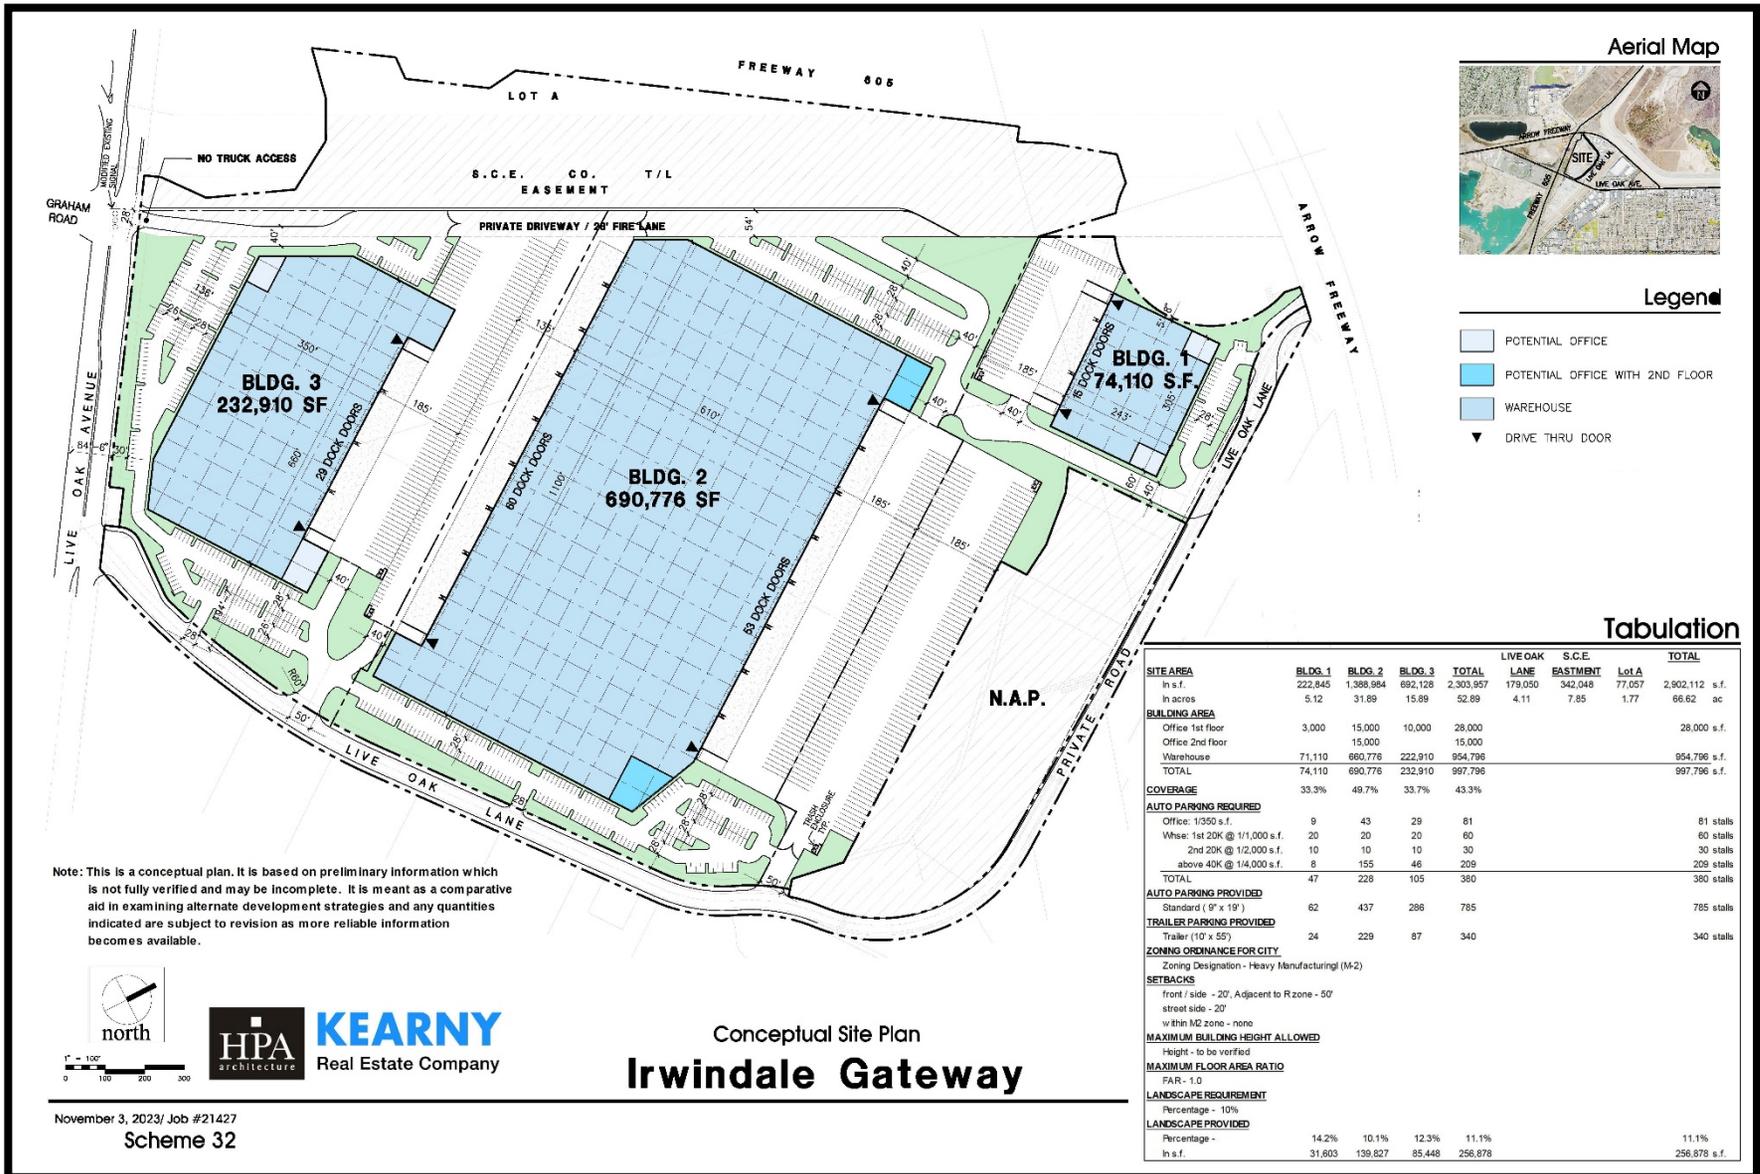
CONCEPTUAL SITE PLAN WITHOUT BESS
